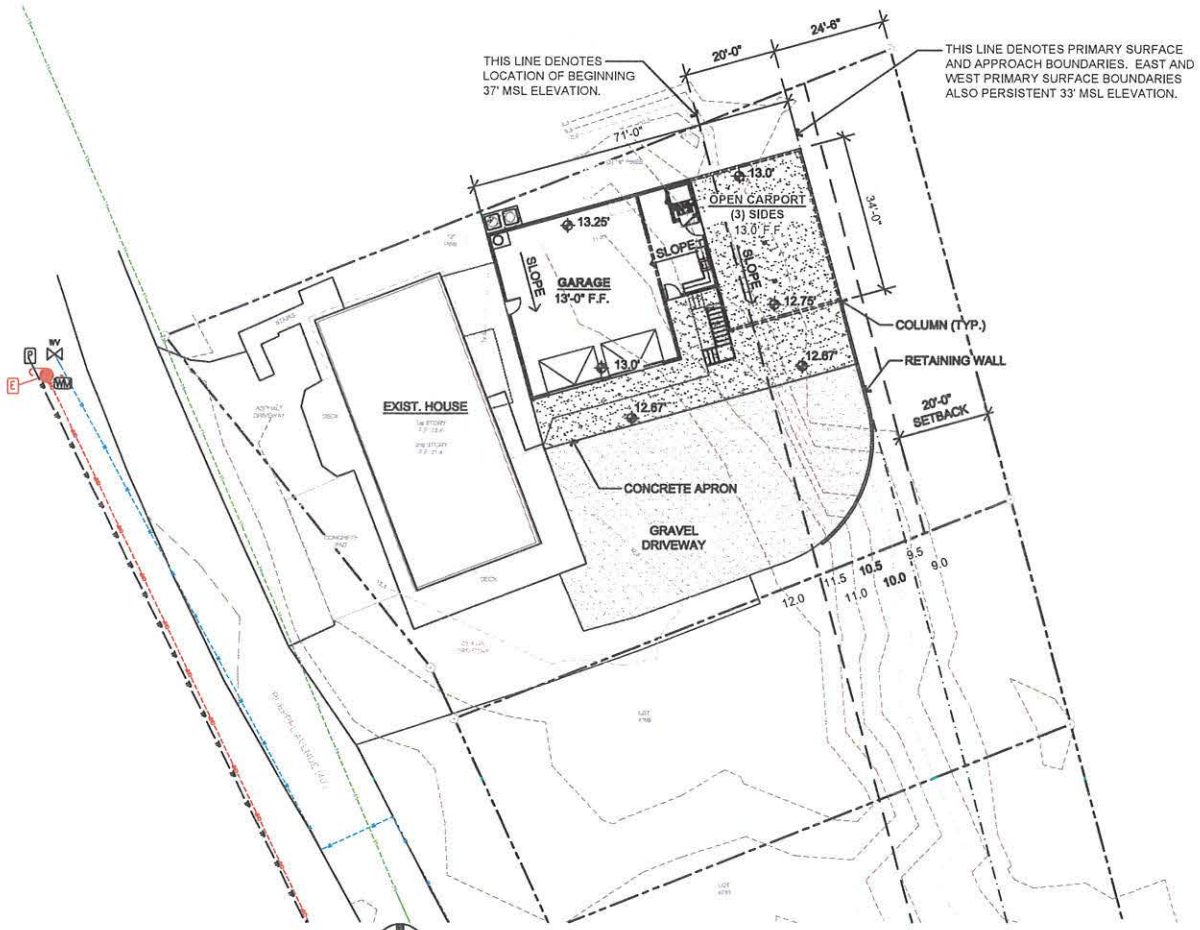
PROPOSED CONDITIONS SITE PLAN
